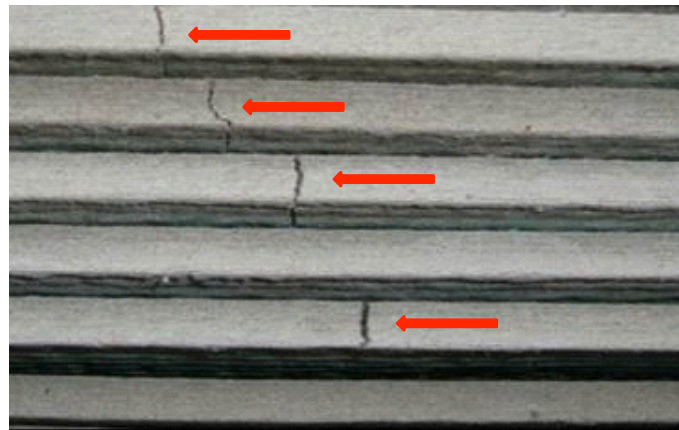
Arrows show typical edge cracks in the covering wave of the roof sheet.
